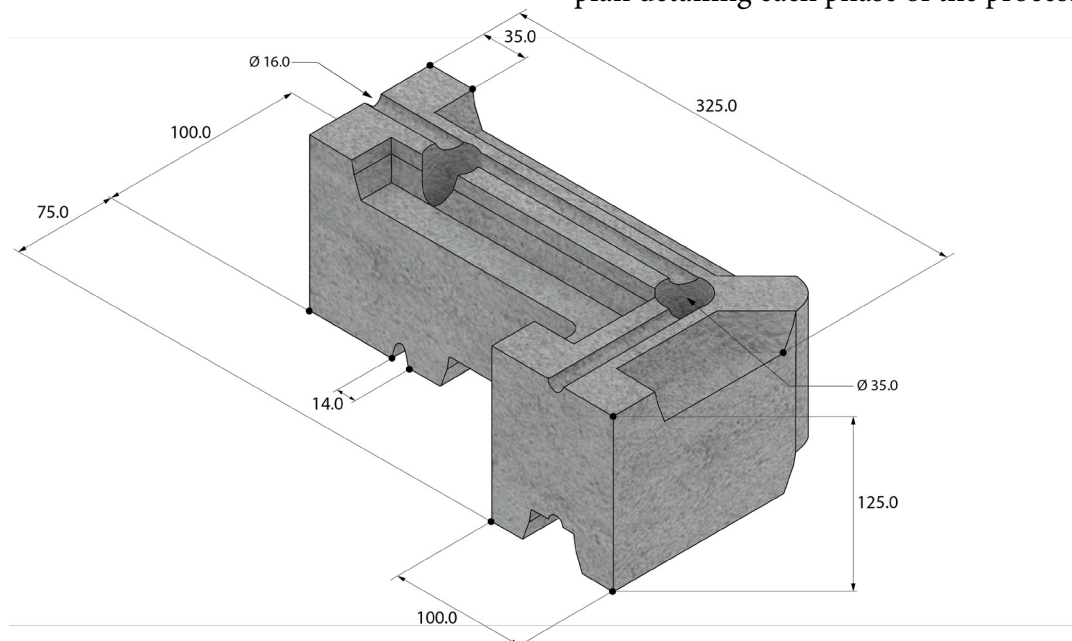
Annotated dimensions of the modular precast column jacketing block (all dimensions are in mm) (author's own work)
